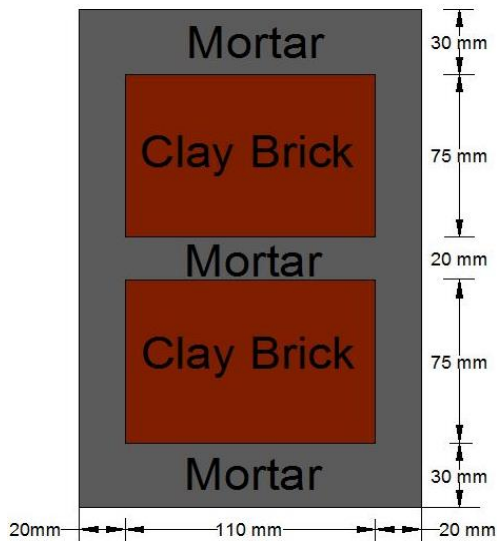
(a) Cross-section of masonry beam with cement mortar as bed
